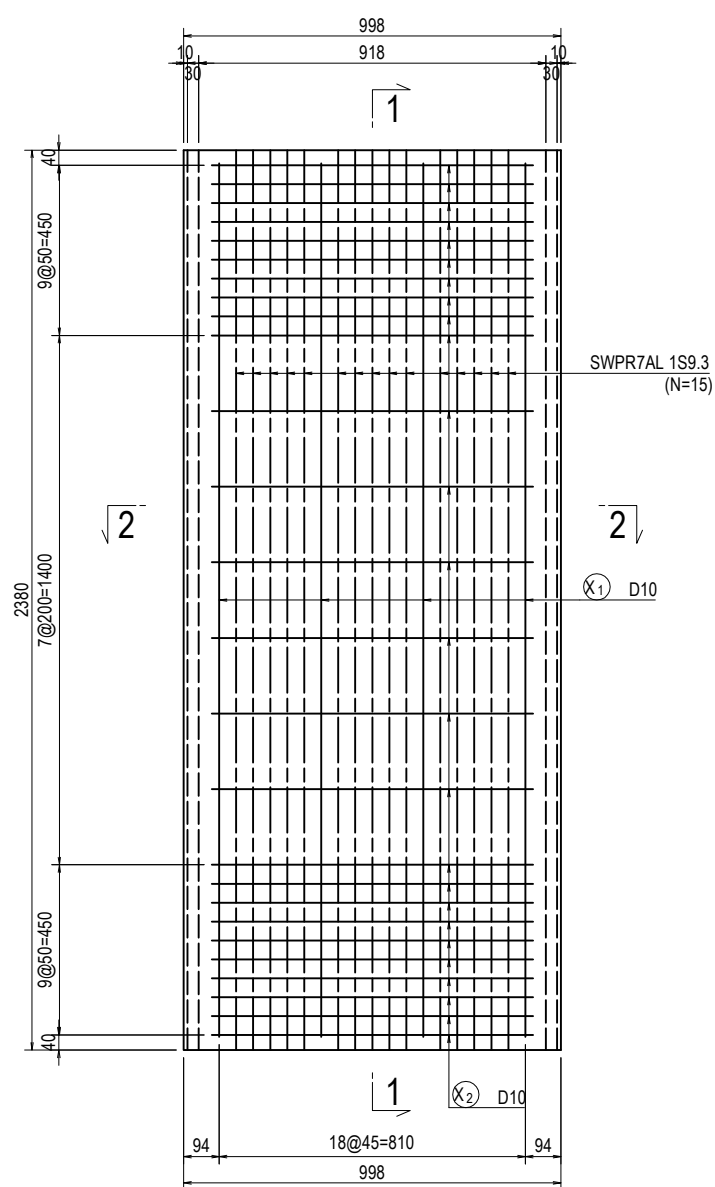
# DETAIL OF PC PLATE FOR DECK SLAB (PF7-PF11)
